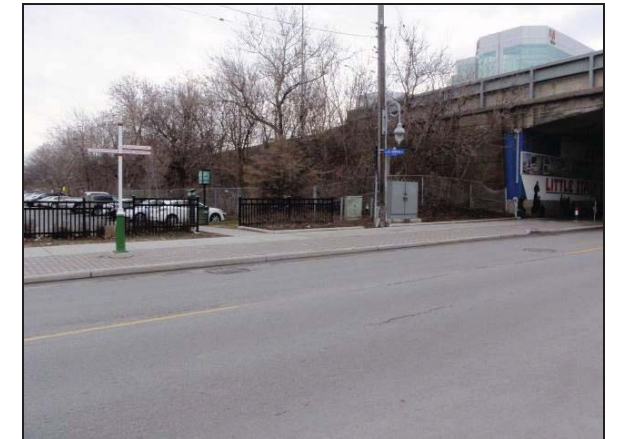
Southeast view of NE quadrant of Highway 417/ Preston Street bridge.
